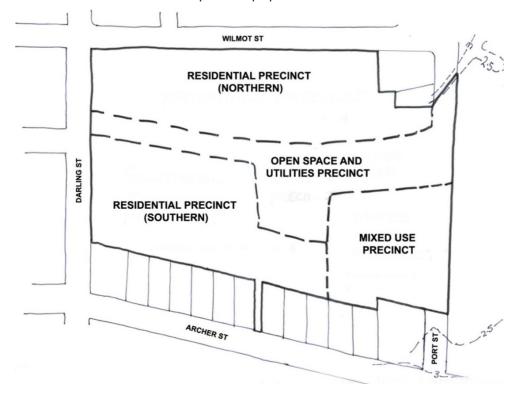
Port Sorell Waterfront Site Precinct Plan
